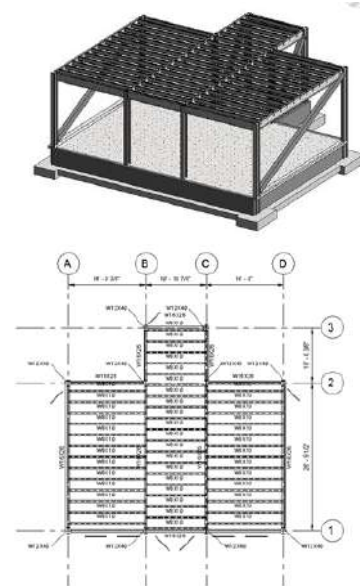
Top: structural BIM model; bottom: first floor framing plan
